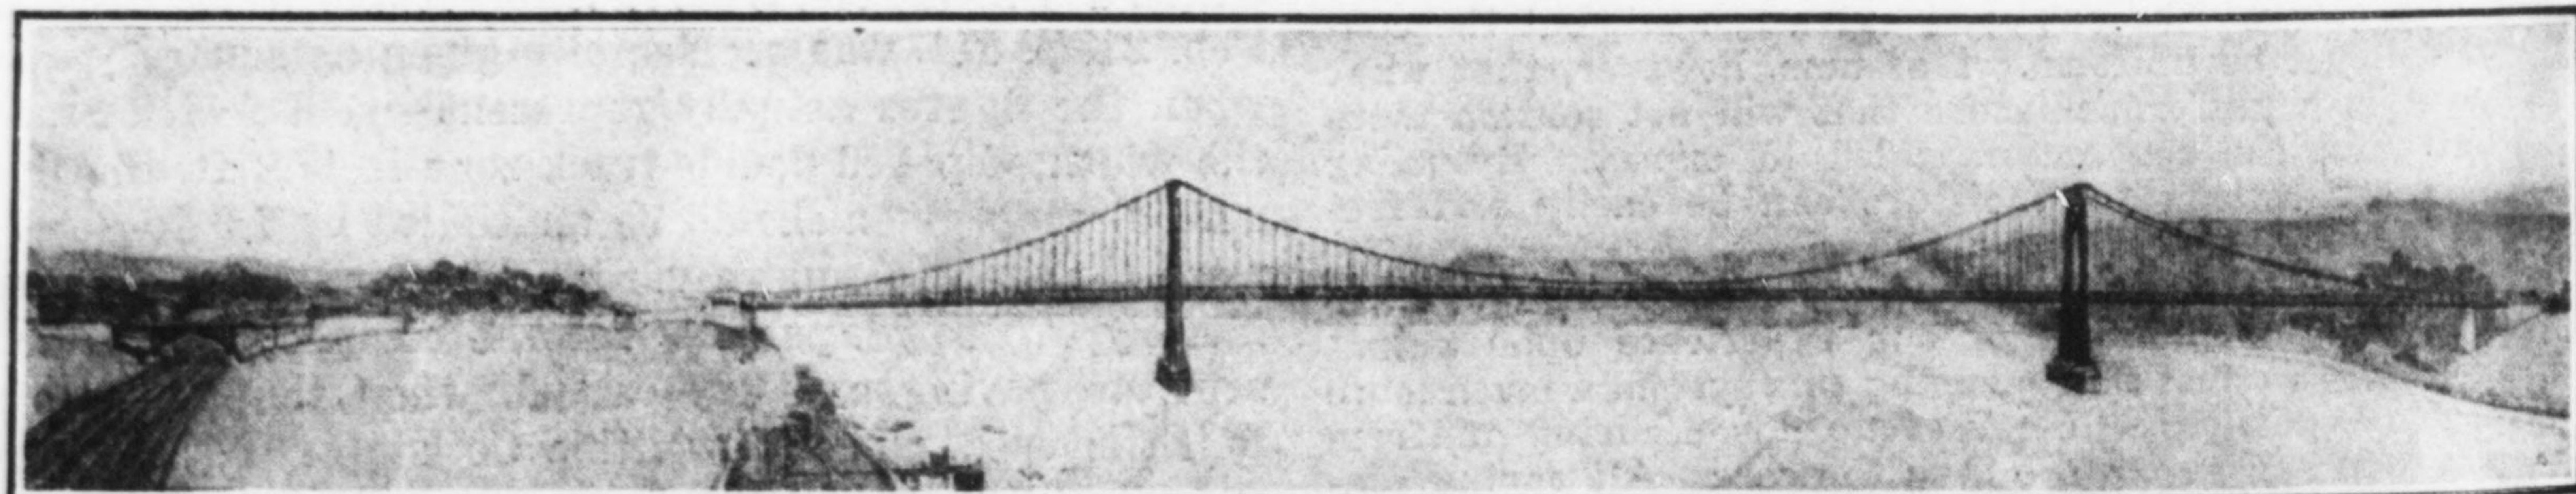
SINGLE SPAN FOR MID-HUDSON BRIDGE, CHOSEN WITH REGARD TO NAVIGATION AND FOUNDATION CONDITIONS
